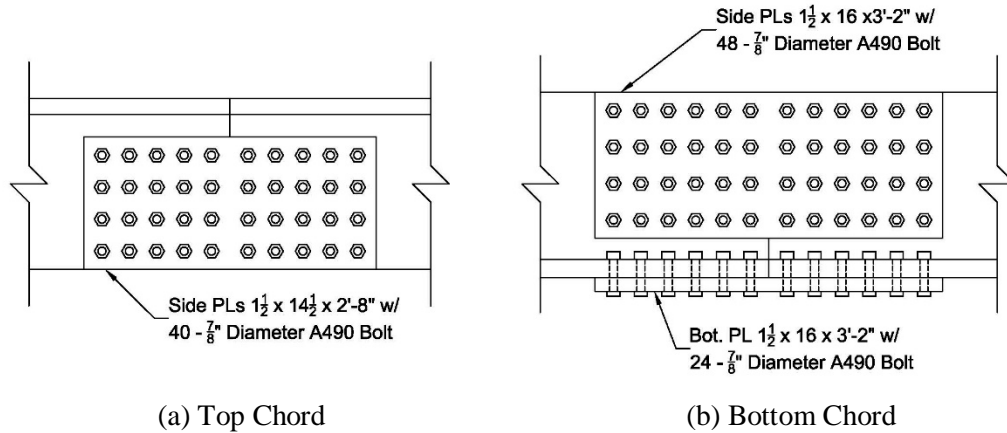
Splice Connection Details for the Single-Splice in Truss 1
